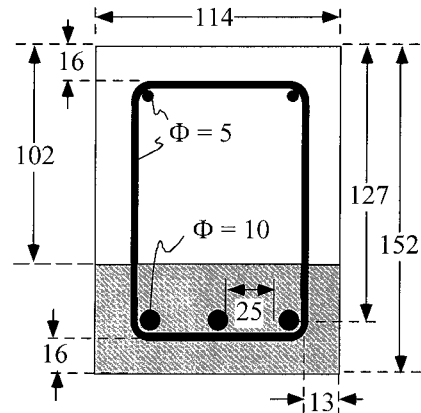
Geometry of the R/C beam with ECC layer and reinforcement details.
